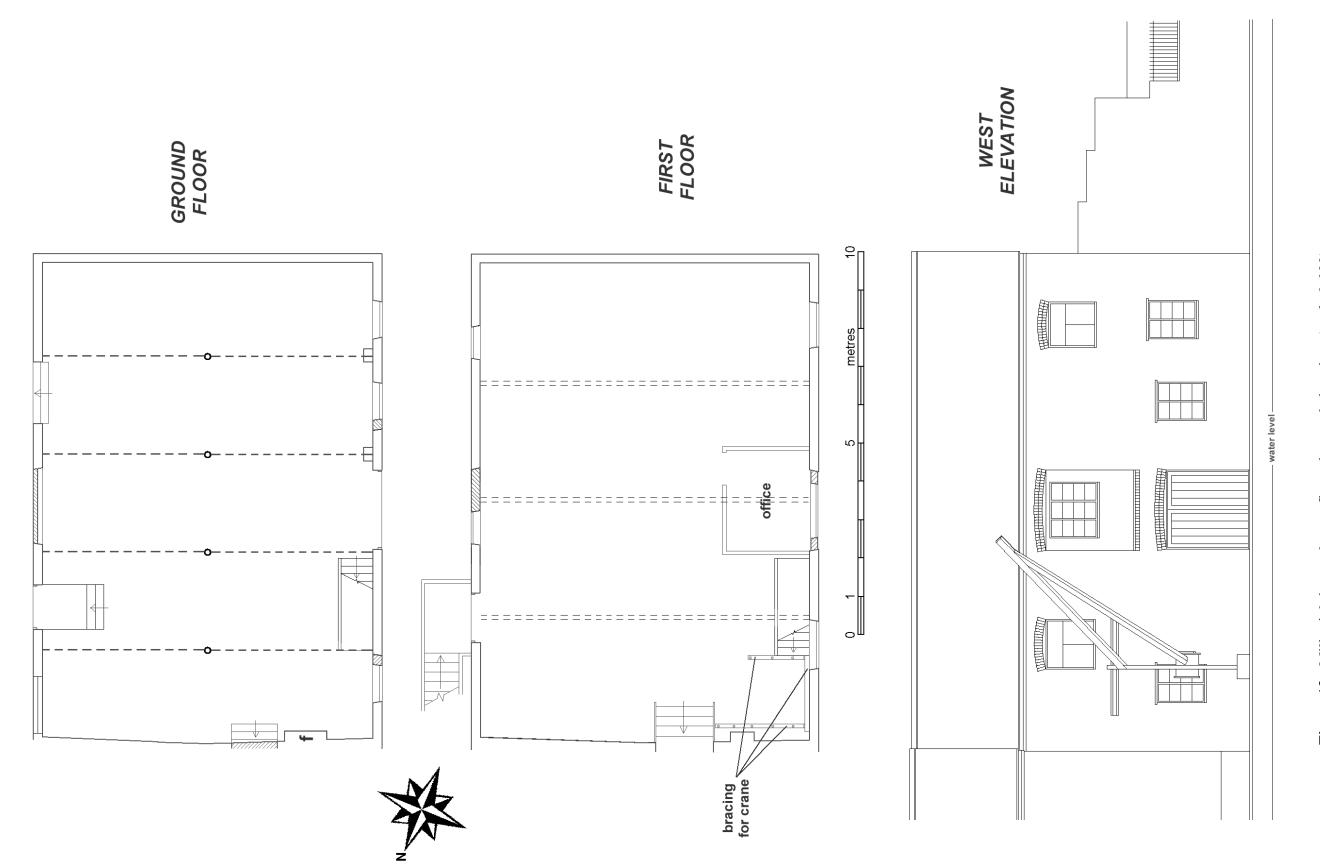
Millwright's warehouse, floor plans and elevation (scale 1:100)
